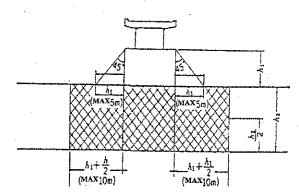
Size of Guard to Protect Riverbank below Bridge
